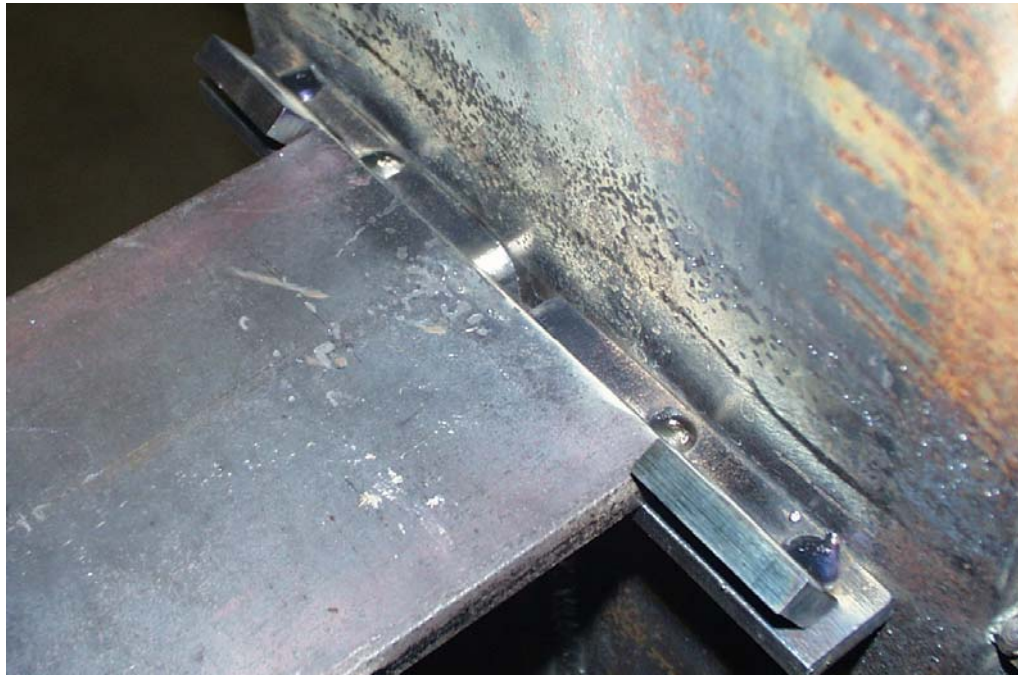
Tack welds for link top flange of Specimen NAS-RLP
